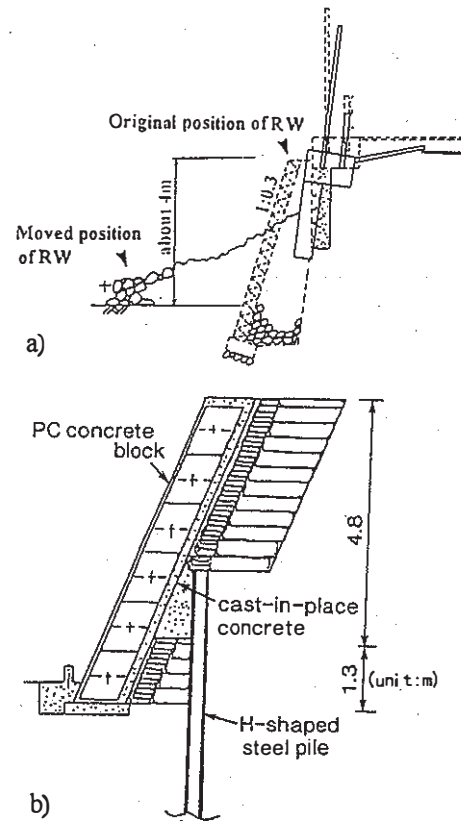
Cross-sections of a) a typical damaged masonry RW constructed in around 1925 (MS1 in Fig. 4) and b) a GRS-RW by reconstruction (the facing consists of PC concrete blocks, which were fixed afterwards to each other and to the backfill), between Setsu-motoyama and Sumiyoshi Stations, JR Kobe Line.
